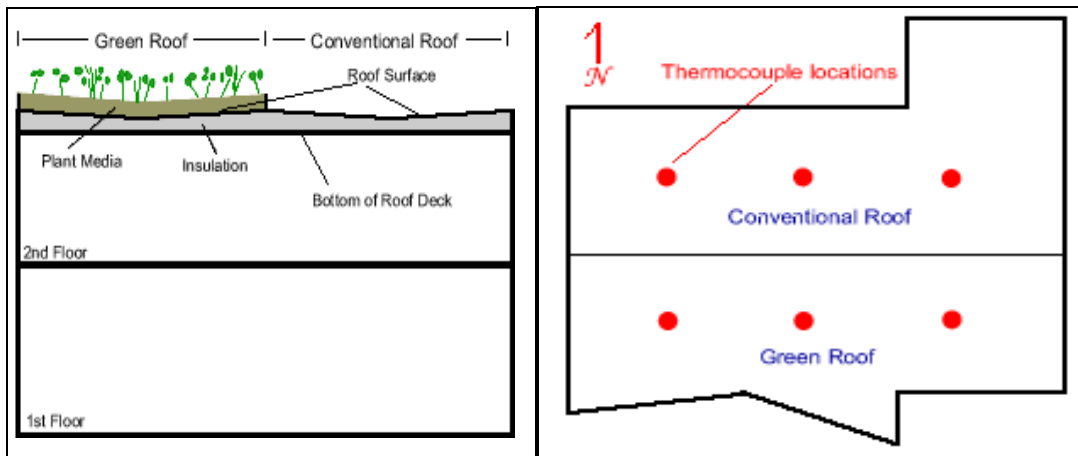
Roof diagram with sensor locations. Figure 4. Building section diagram
